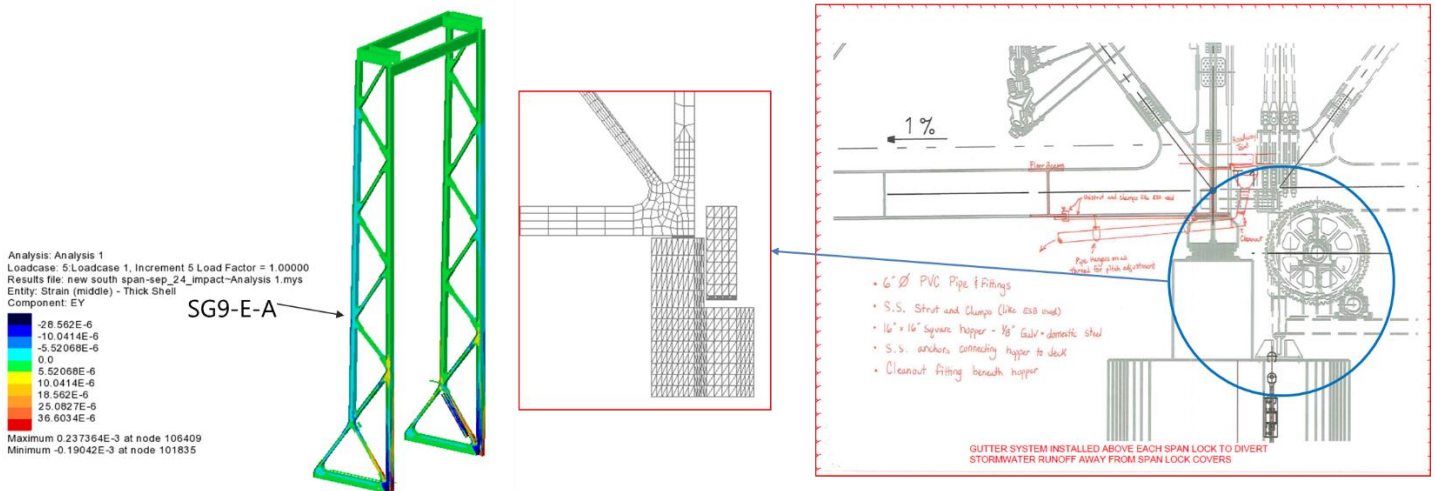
Structural Modeling Protocol Illustration of Lift Loading at the Memorial Bridge
